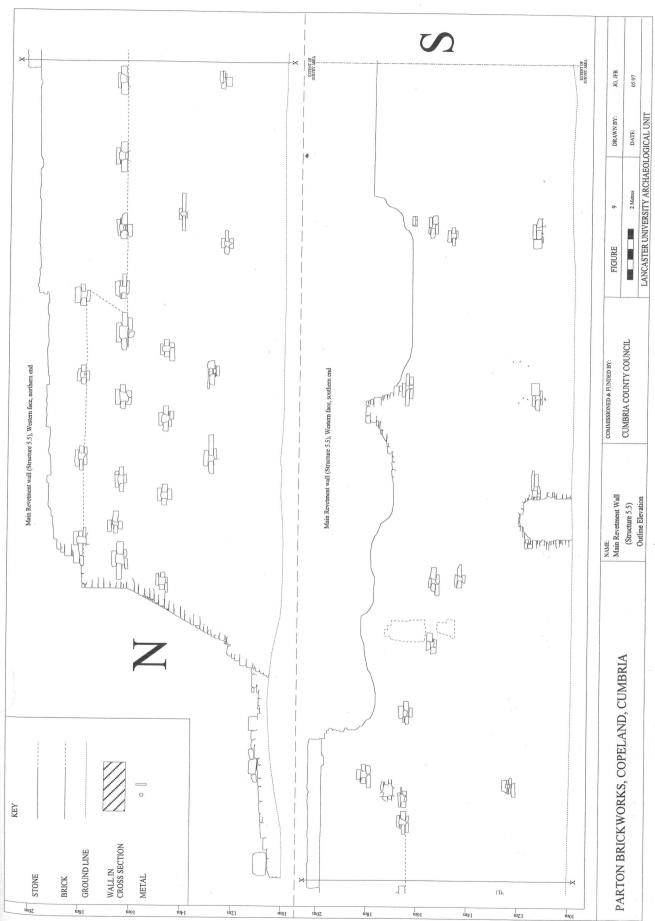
West elevation of the main terrace wall (Structure 5.5)
